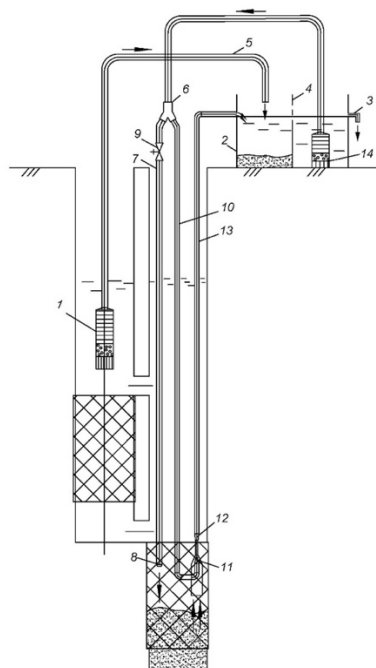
Schematic diagram of a hydraulic elevator installation during the repair of a two-column two-filter water well
